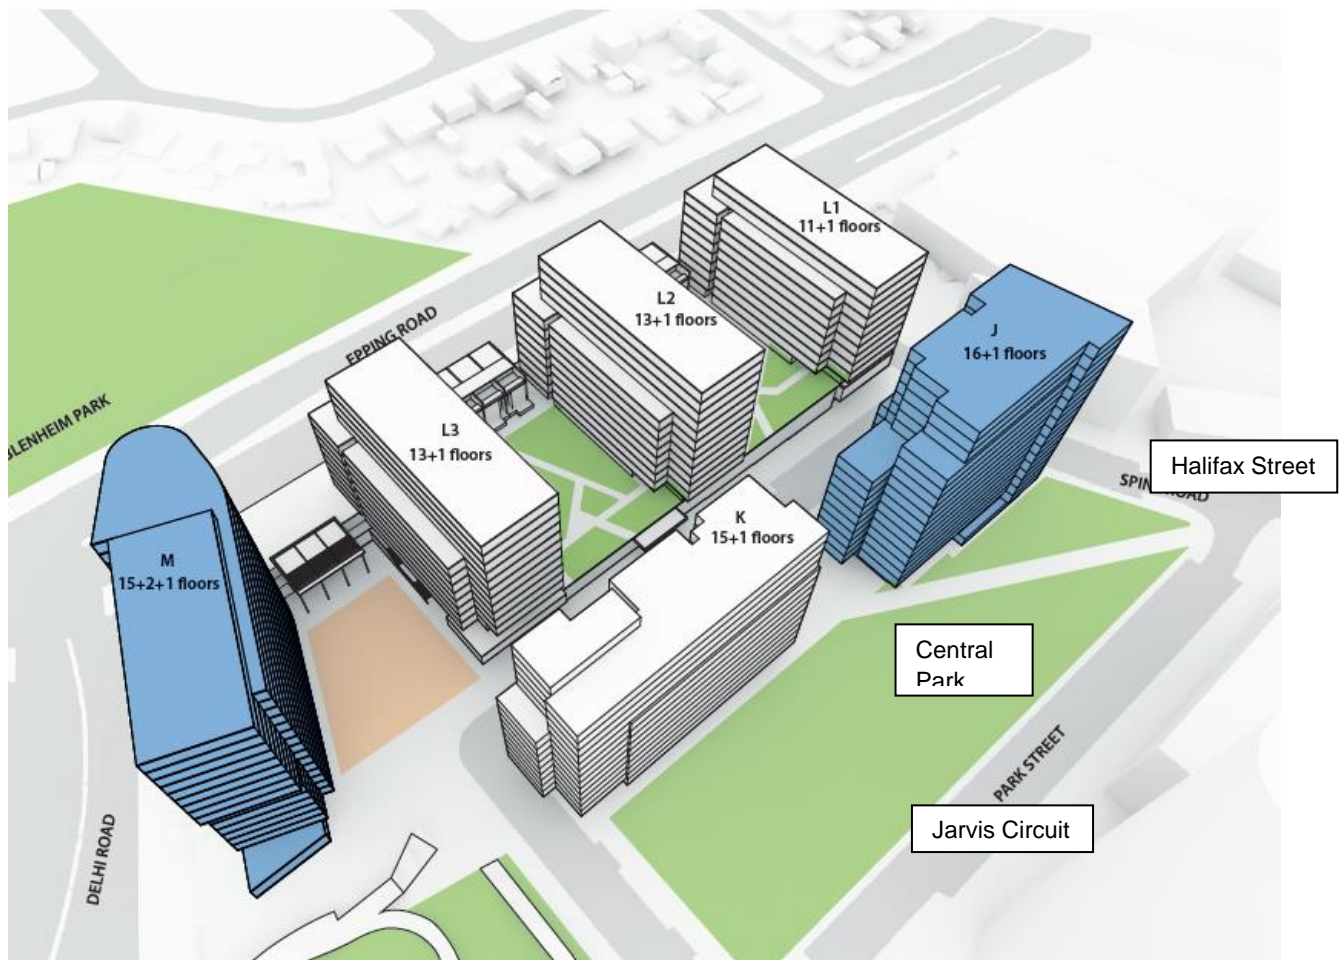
Block diagram of proposed buildings across Lot 104 and Lot 105
